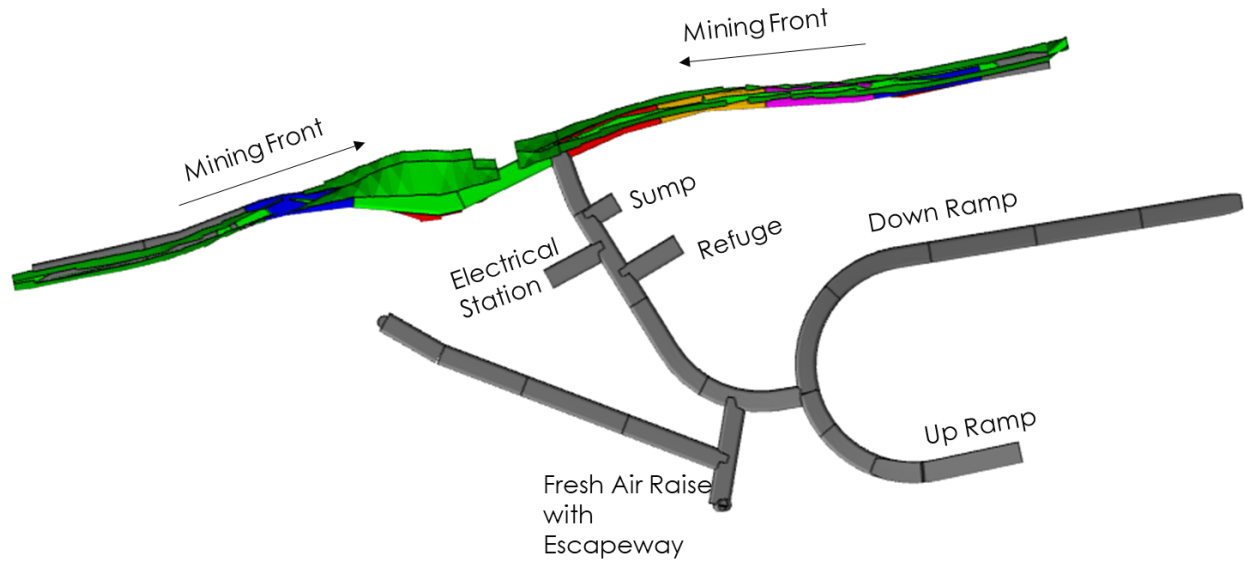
Typical level layout with Modified Avoca method mining fronts
